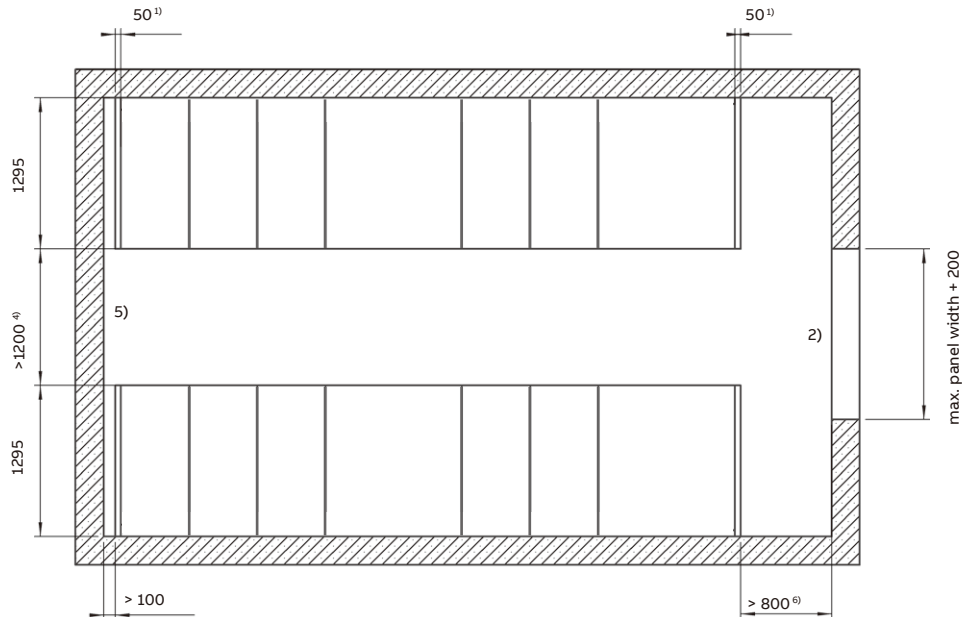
Wall mounting installation, example of a double row installation (Top view, dimensions in mm)
